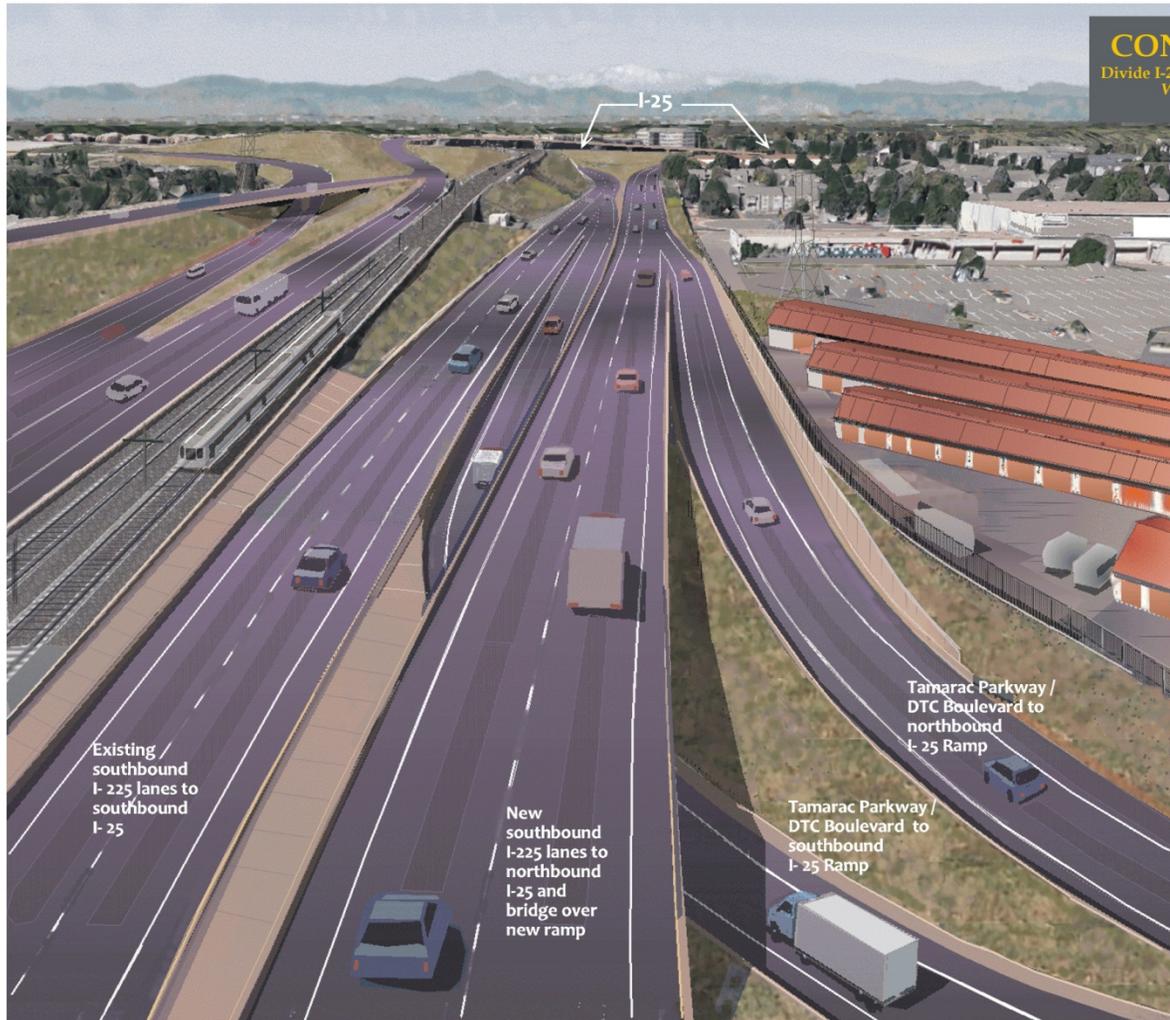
Recommended Alternative Concept - Illustrative View of I-225 Looking West near DTC Boulevard
